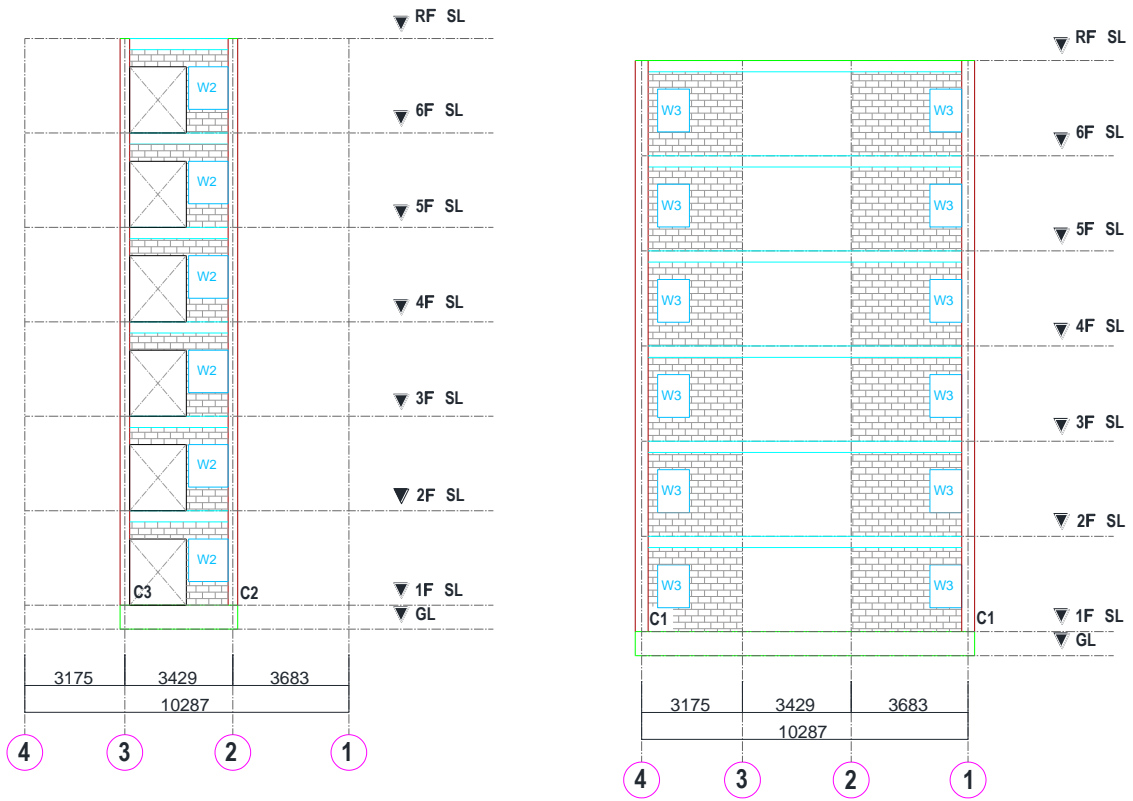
Elevation at Frame A and H, B and G of building no. 3
